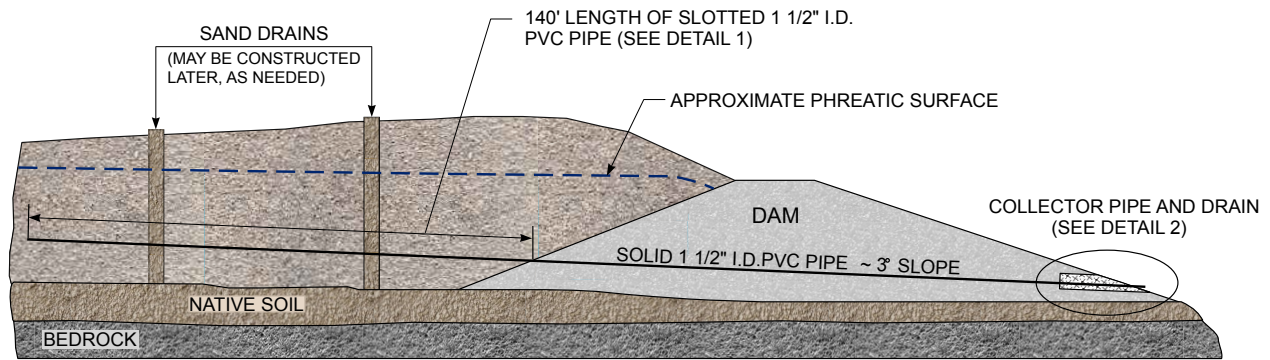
TYPICAL RELIEF WELL INSTALLATION
